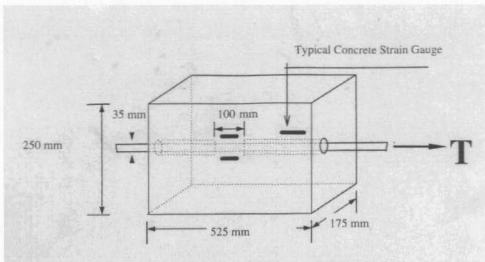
Typical high strength concrete specimens with the position of concrete strain gauges
